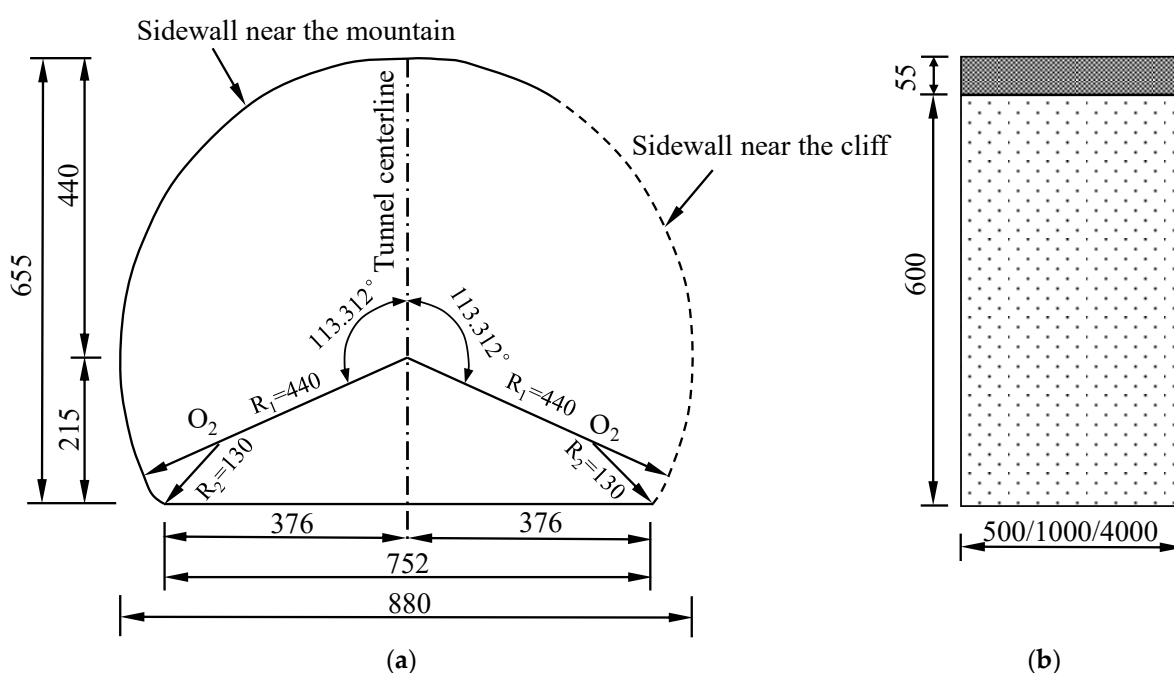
Tunnel cross-section and sidewall opening dimensions of the prototype hanging tunnel (unit: cm). (a) The sectional dimensions of the prototype hanging tunnel; (b) the dimensions of the sidewall openings.
